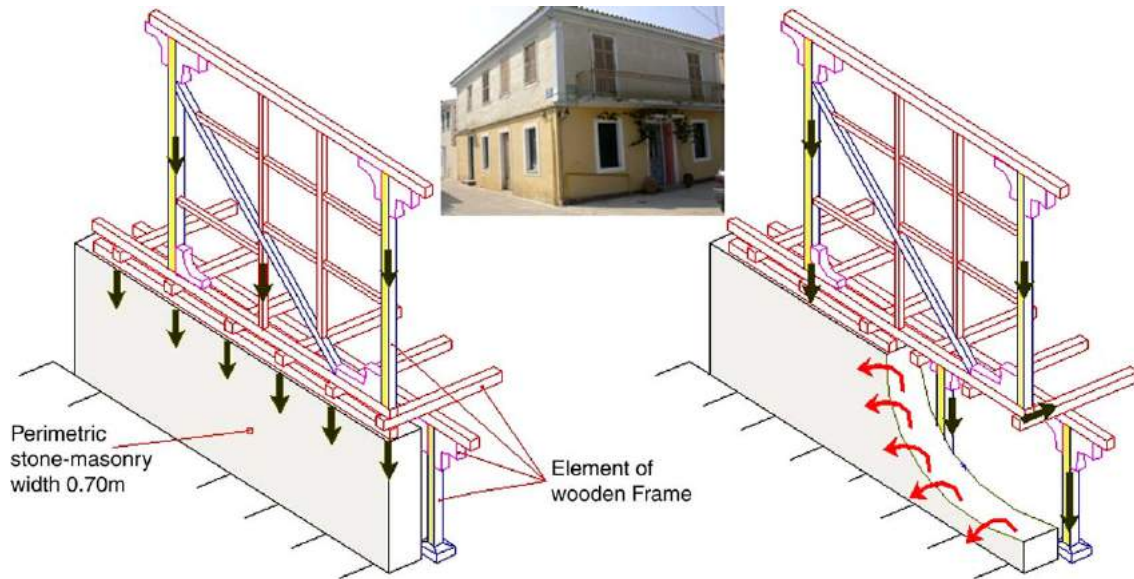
Traditional dual system building (inset photo) and mechanism of activation of secondary wood frame in case of failure of masonry load-bearing wall.
